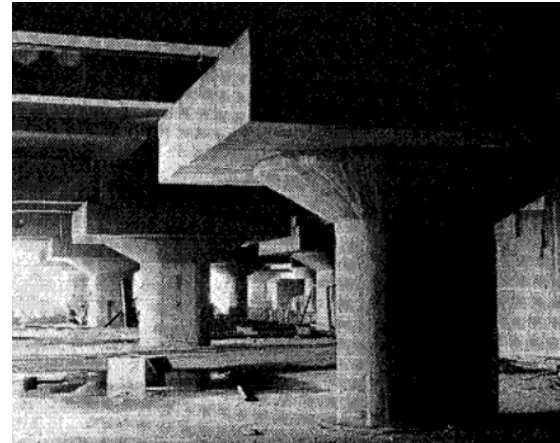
underground construction, source from Kantoorgebouw voor Centraal Beheer te Apeldoorn
